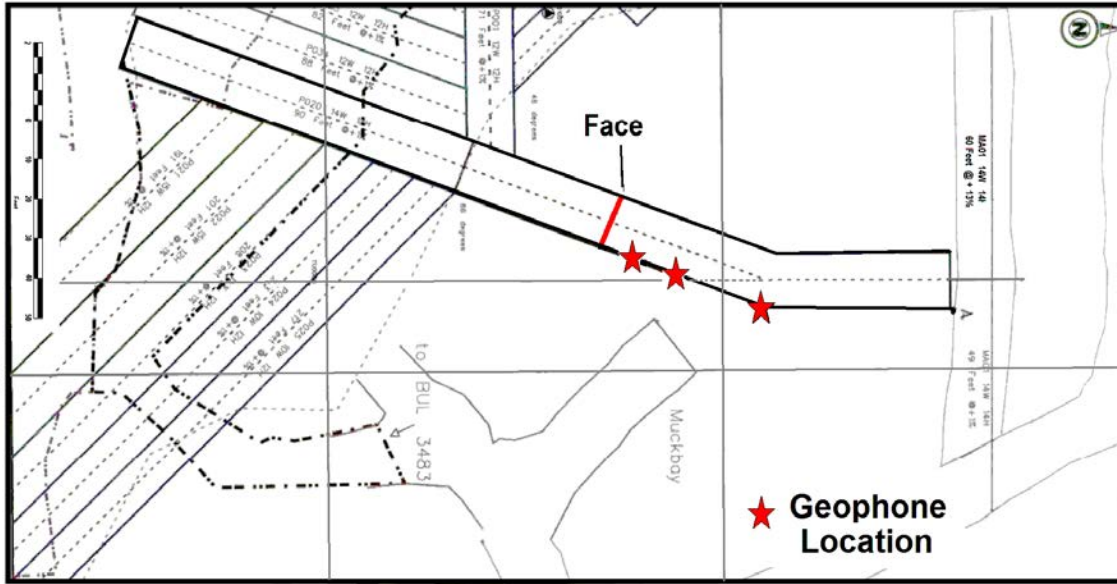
3471 development panel – plan view – Turquoise Ridge JV Mine
